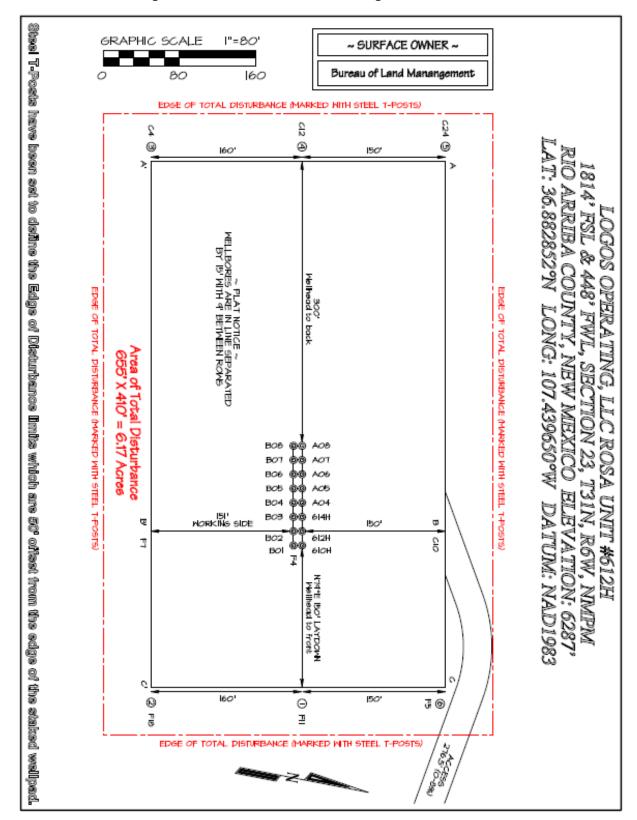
Rosa Unit Pad 10 Plat showing 276.7' Access Road
